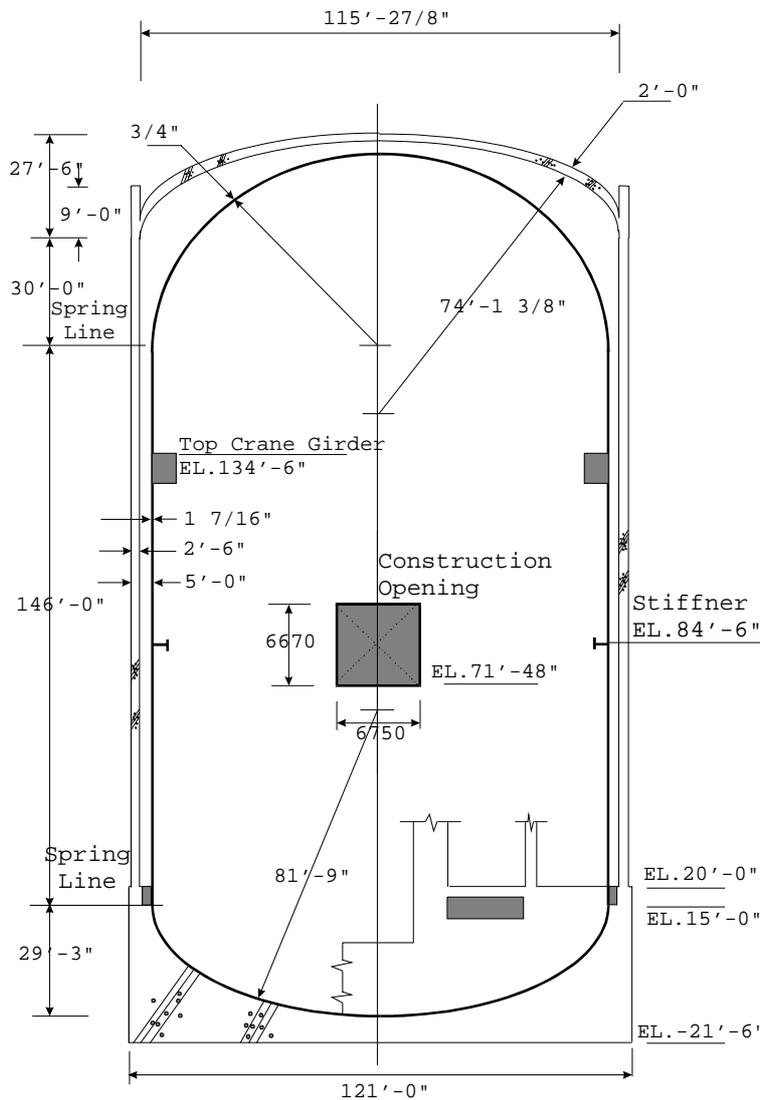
Containment Vessel Cross Section for Kori-1 SGR Project
